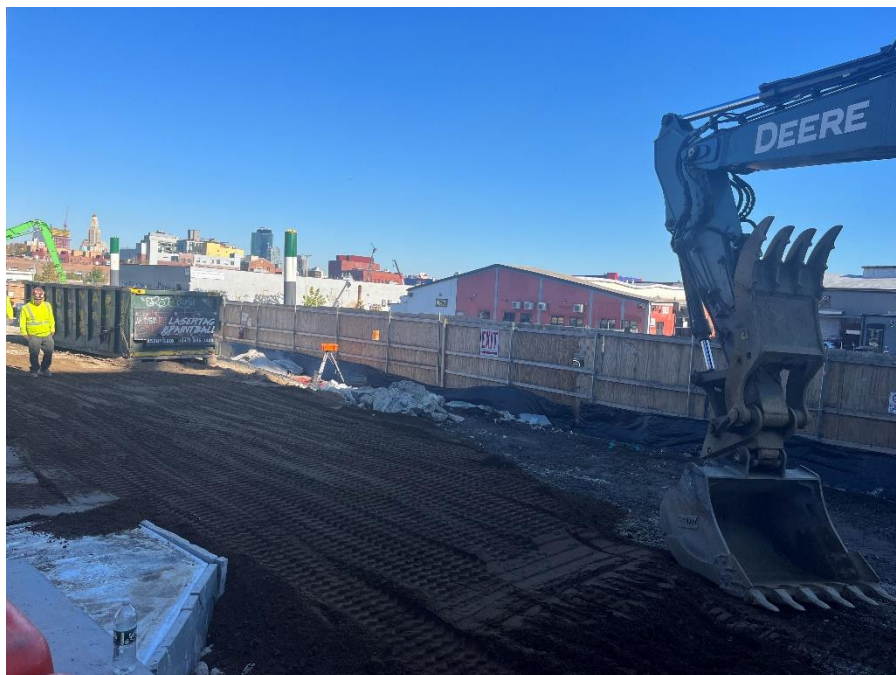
Bauer grading the backfill area in the southeastern part of the site (facing northeast)
